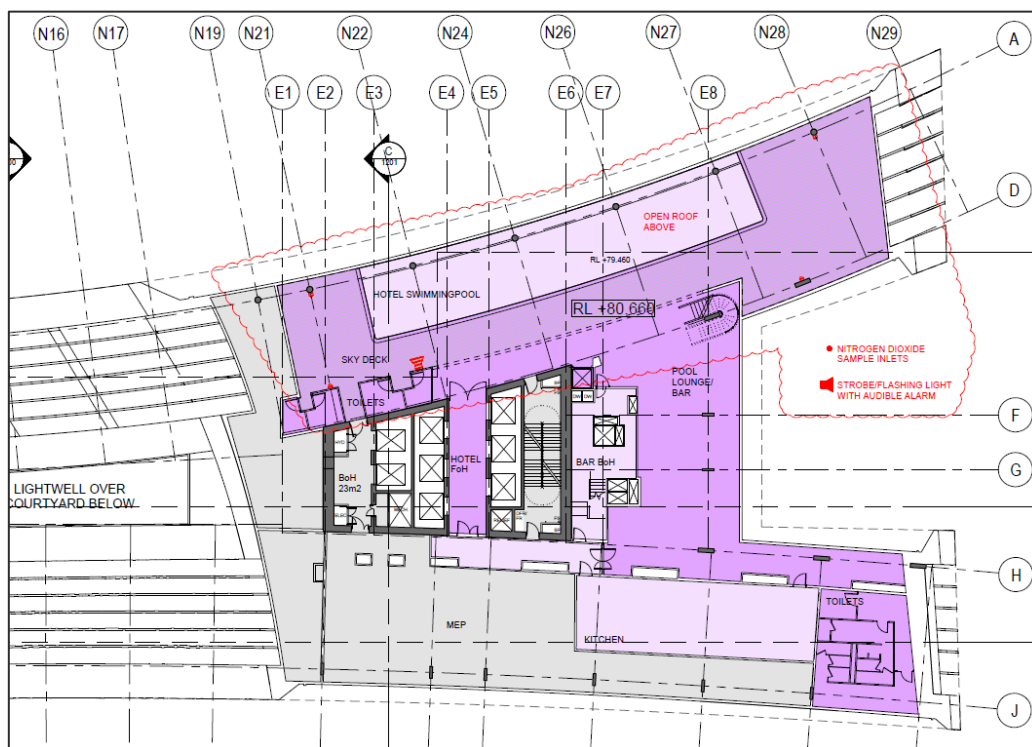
| Level 22 plan showing location of NO₂ monitors and alarm (Source: Applicant's Architectural drawings).
